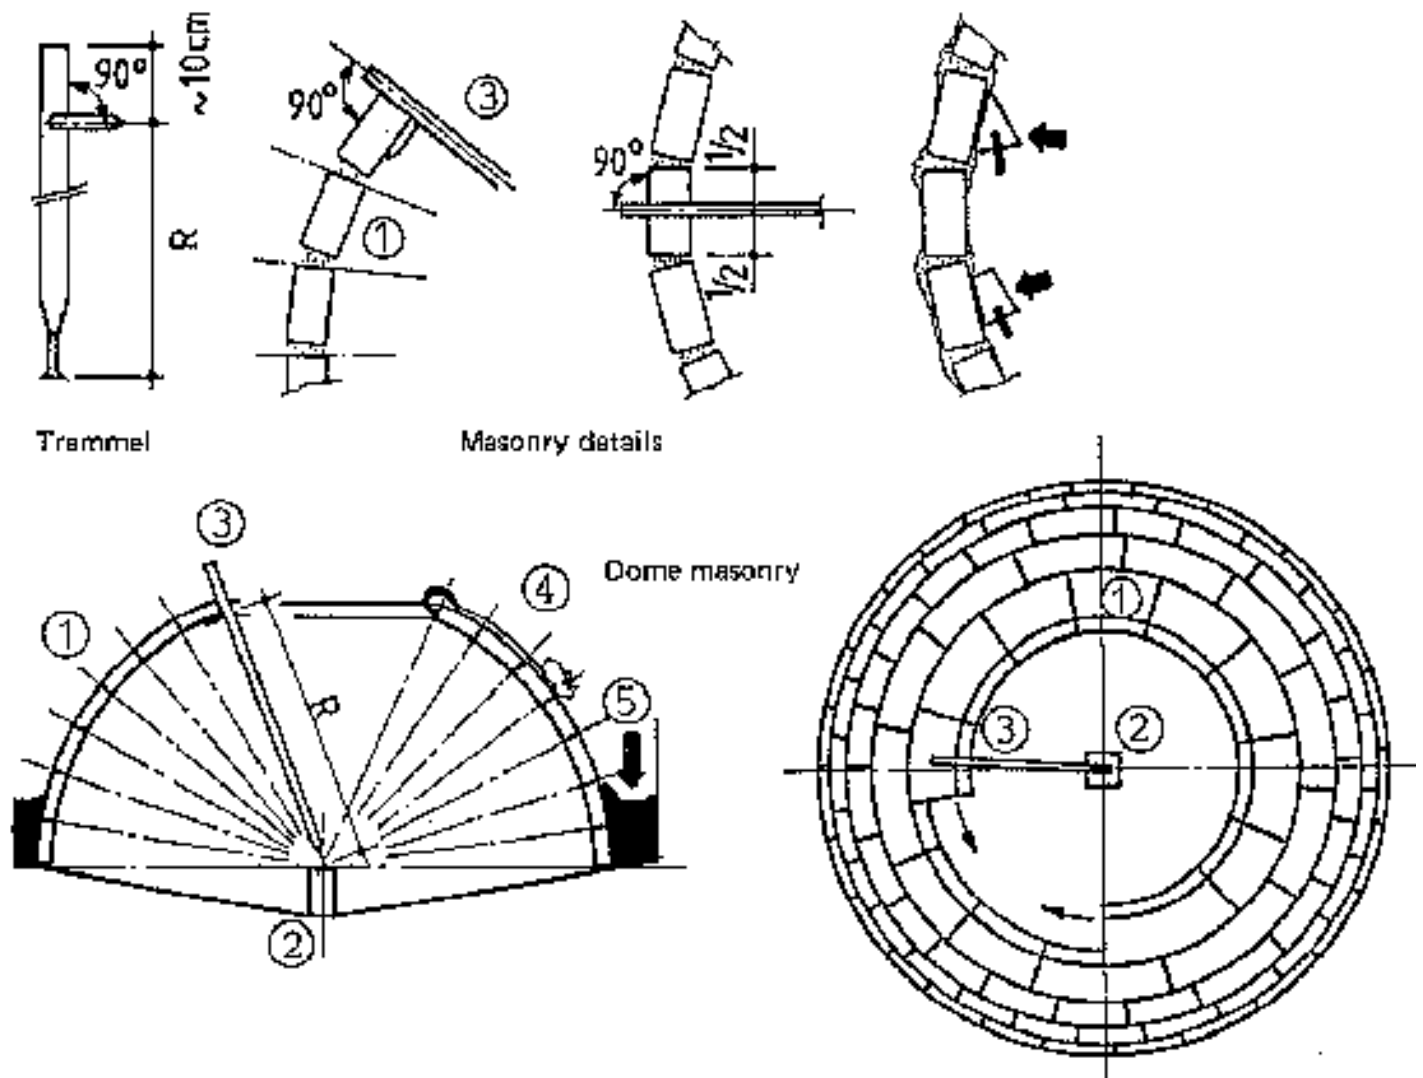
Construction of a spherical dome from masonry. 1 Dome/masonry, 2 Establishing the centerpoint, 3 Trammel, 4 Brick clamp with counterweights, 5 Backfill (Source: Sasse 1984)
